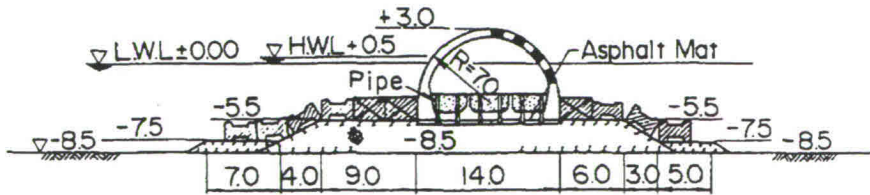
, Possible cross section of semi-circular caisson breakwater for extremely high breakers
